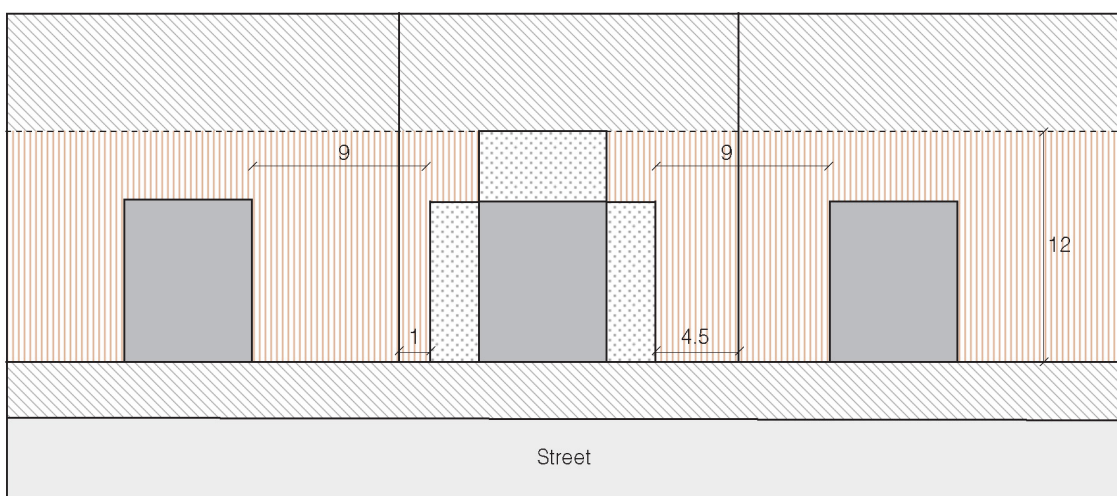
Detail plan of the neighbourhood of Bräcke
